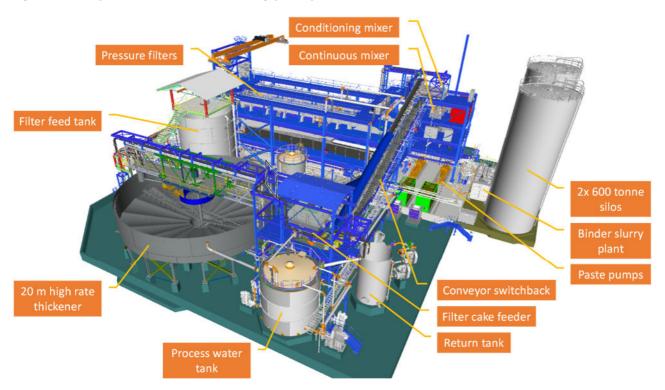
3D model of paste plant (filter building structure removed to show equipment inside building)
